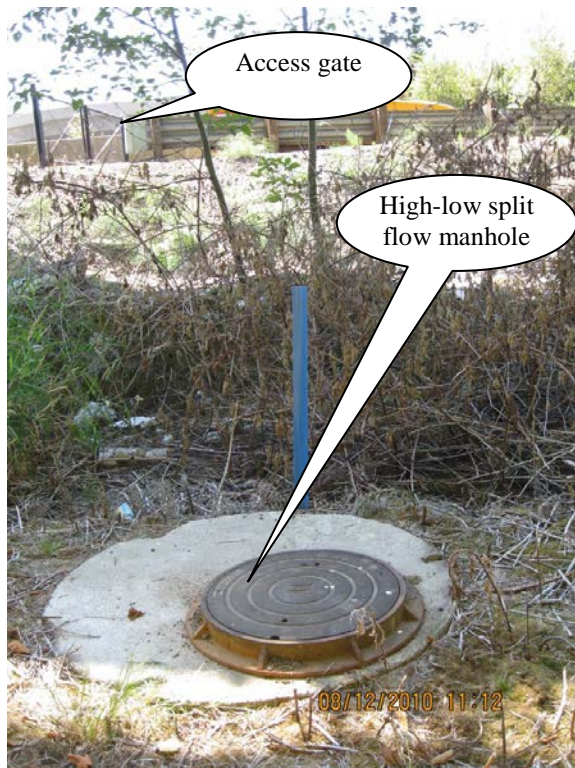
High-low split flow manhole looking towards the south. Access gate is located in the background.
